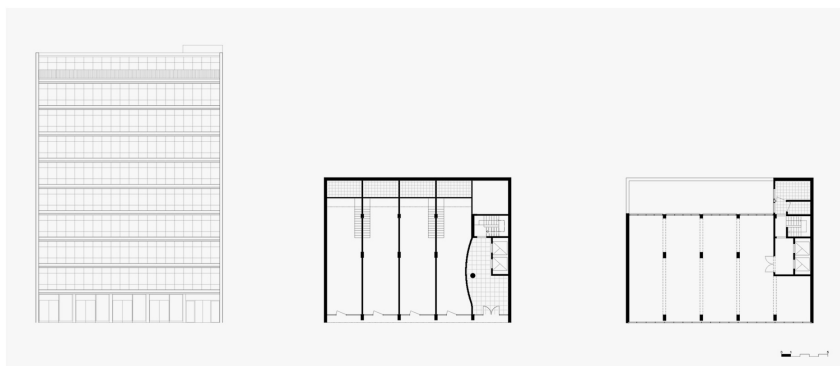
Lavalle 557, Buenos Aires (redrawn from original plans by the author)
